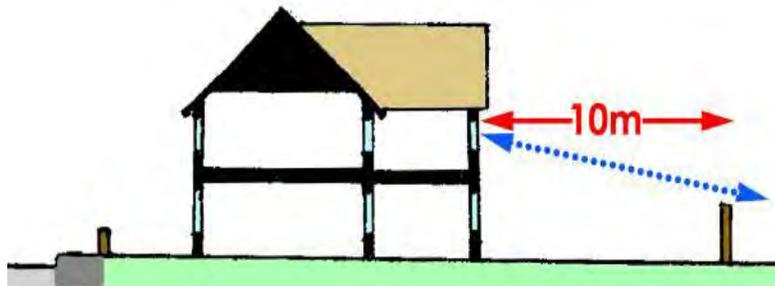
A minimum separation distance of 10m is required between a proposed first floor habitable room or elevated ground floor windows and the rear/side garden boundary of neighbouring properties
